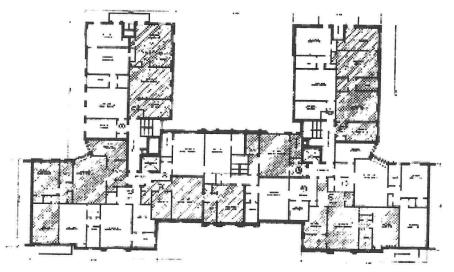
Elevator Building plan, Phipps Garden Apartments. Stein, 88.
